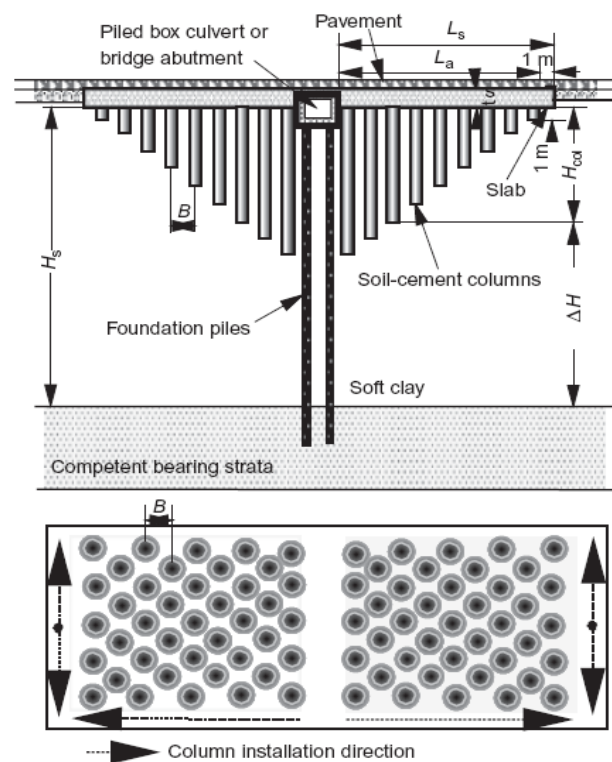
Section and Plan View of Soil-Cement Pile Supported Approach Embankment (Shen et al., 2007)
